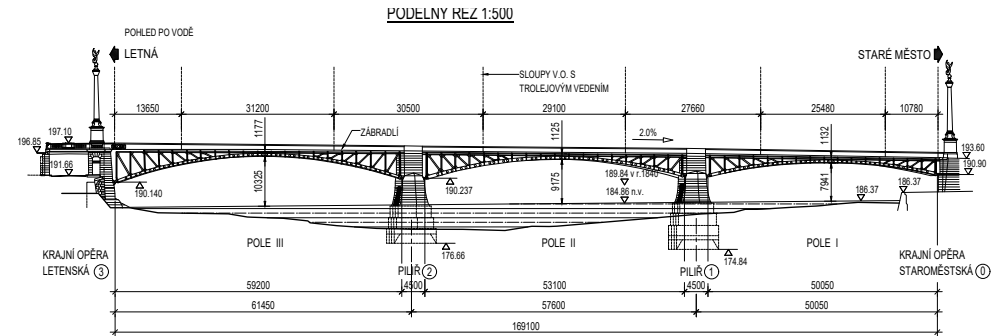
(a, b) Arch deck-type bridge. Two-hinged truss arches. (Čechův most in Prague from 1908)
